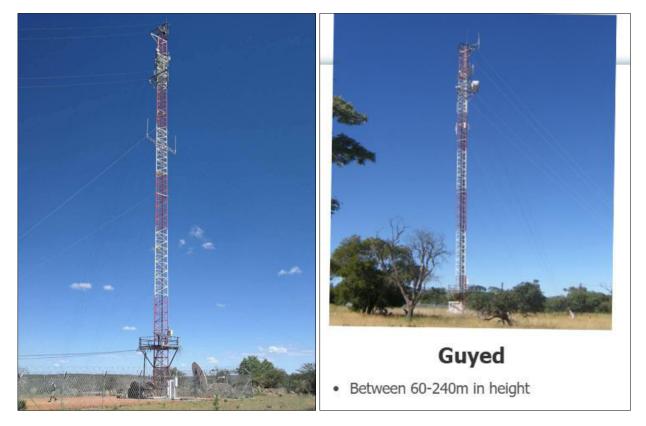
Typical red and white painted guyed mast tower structures in Namibia (source: MTC Namibia and <u>https://powercom.na/</u>)
